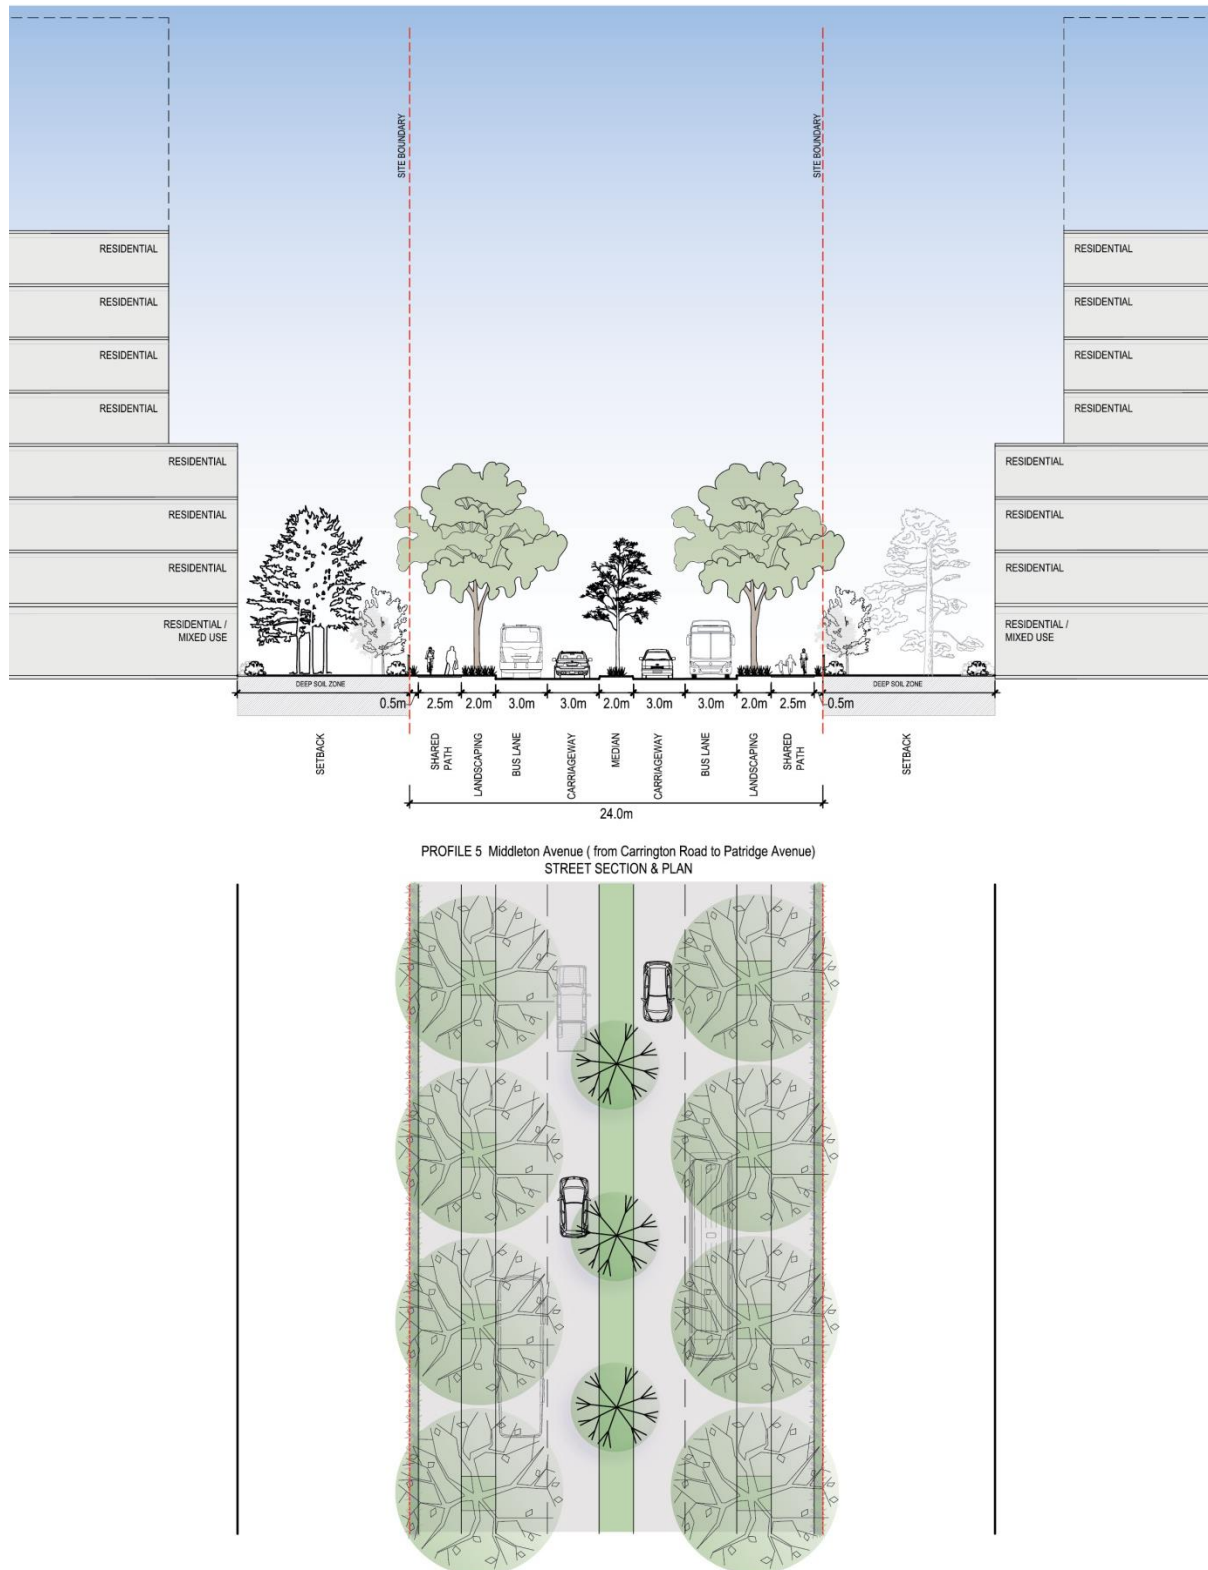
Middleton Avenue (from Carrington Road to Partridge Avenue)
